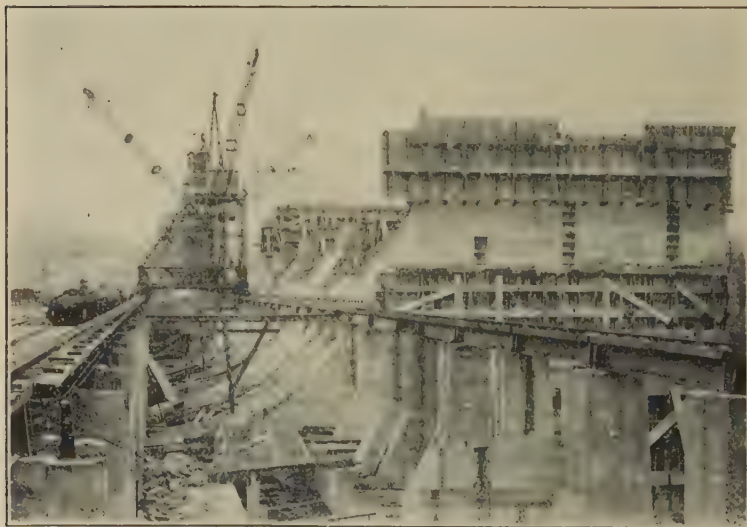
CONSTRUCTION BRIDGE WITH TRAVELER-MOUNTED CRANES.
